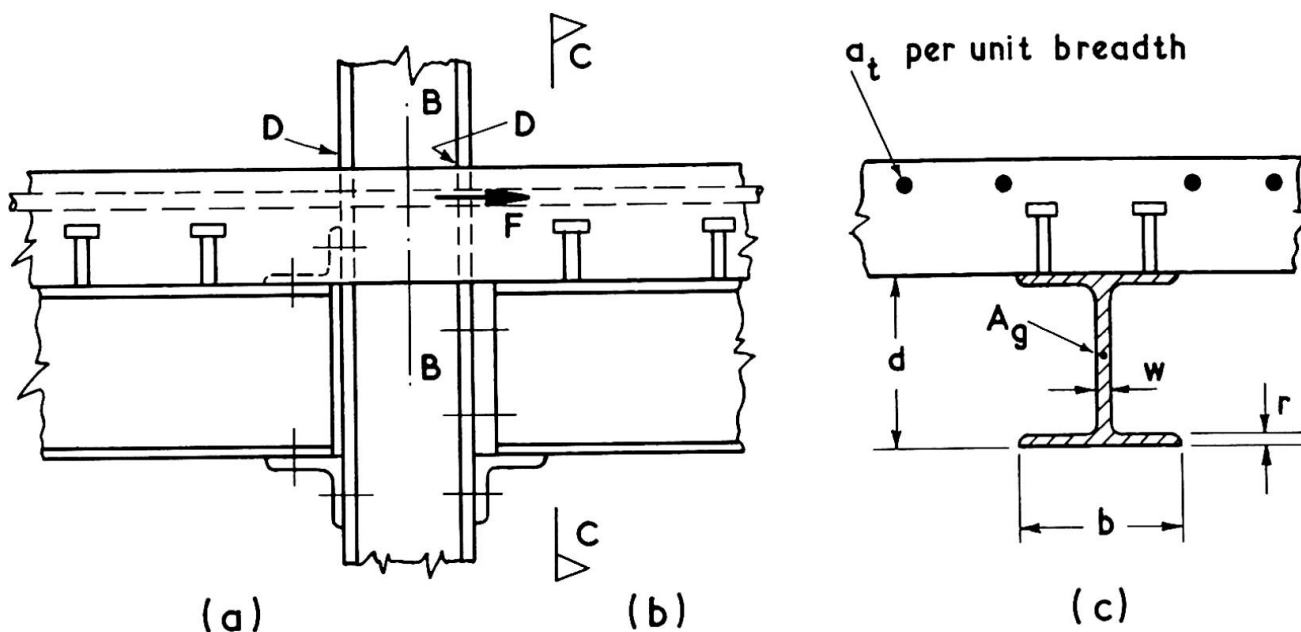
Typical bolted joints between composite beam and steel stanchion
